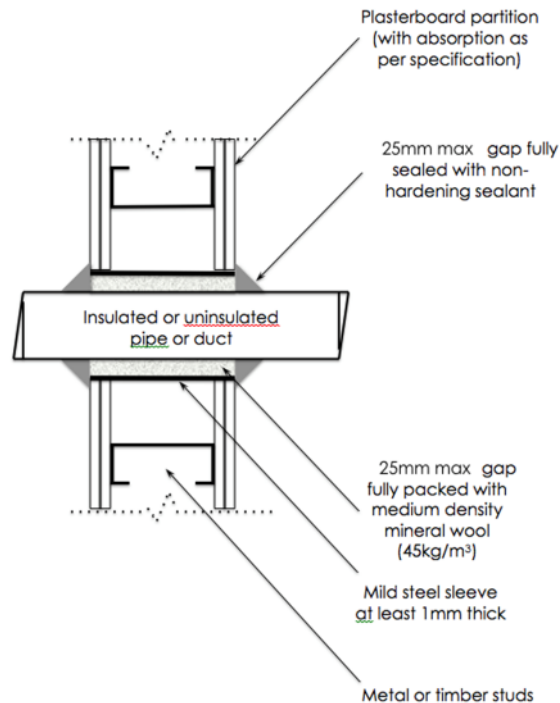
Penetration Details – Dry Walls – without Cover Plates
